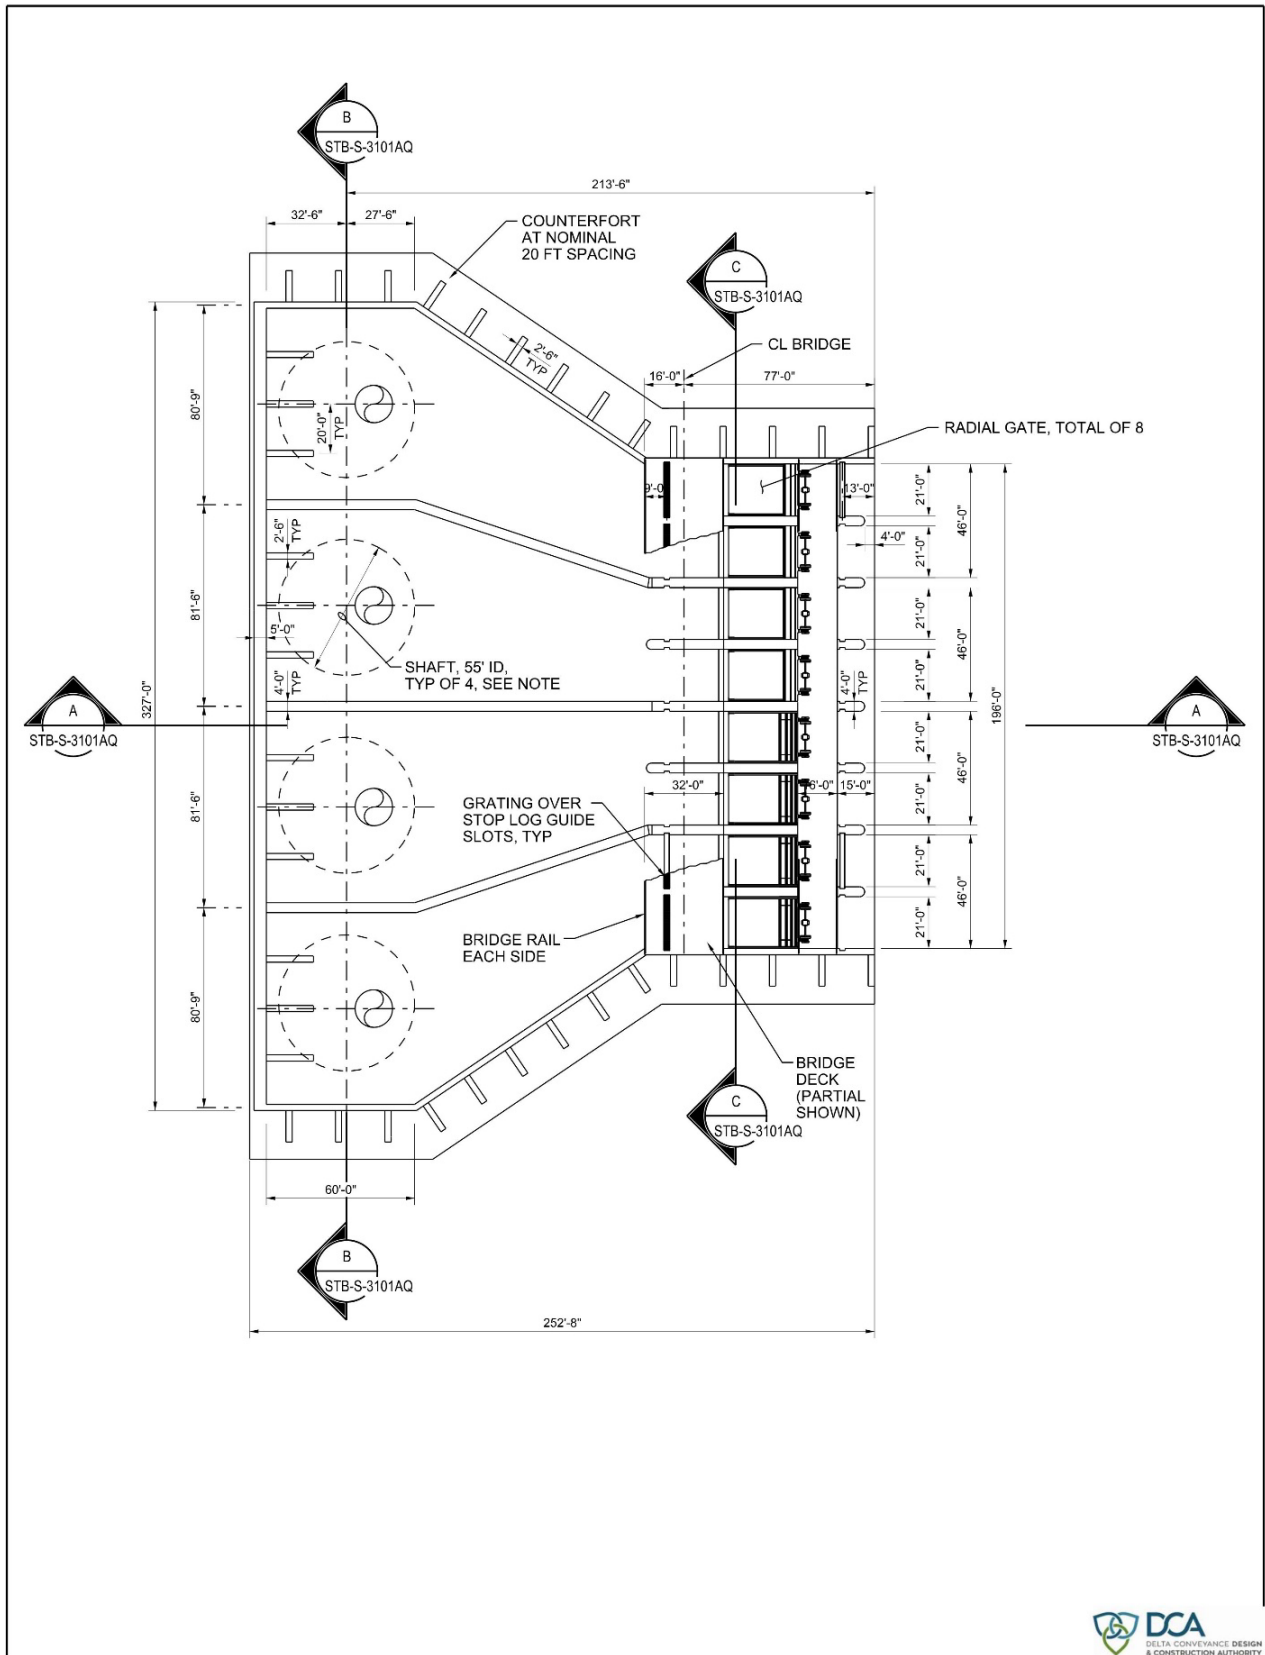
Bethany Reservoir Discharge Structure – Structural Plan
